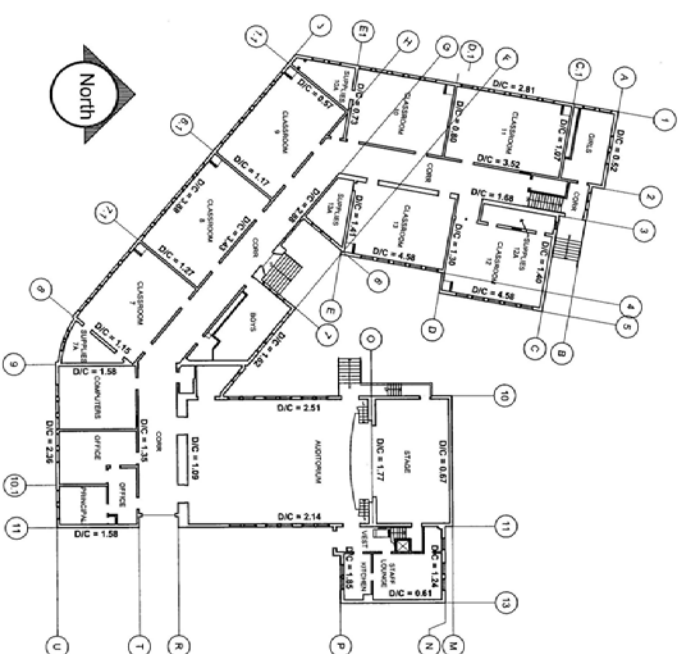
Plan showing the original 1930's building (Buildings A and B) at Wildwood School. Demand to capacity ratios ( $D/C$ ) for the shear walls are also shown.
